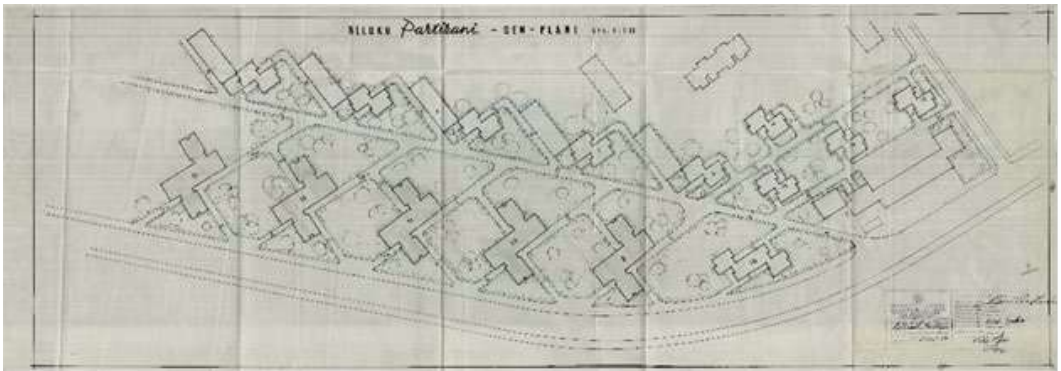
Original site plan of the “Blloku Partizani” (Source: AQTN).
